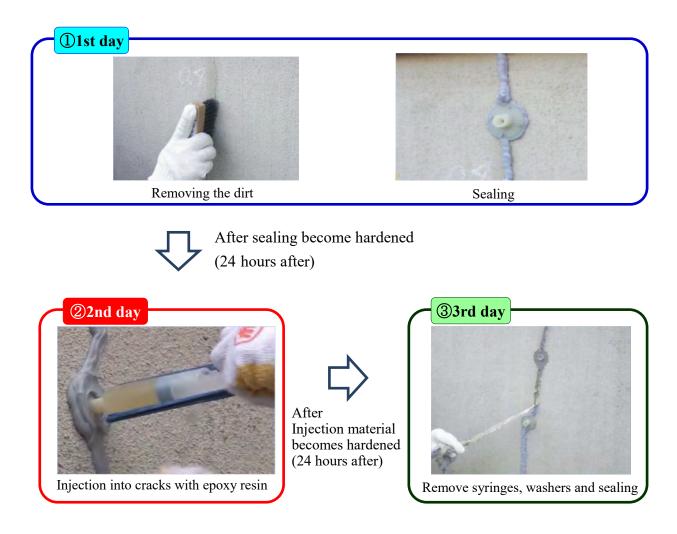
Outline of crack repair method by Epoxy Resin
